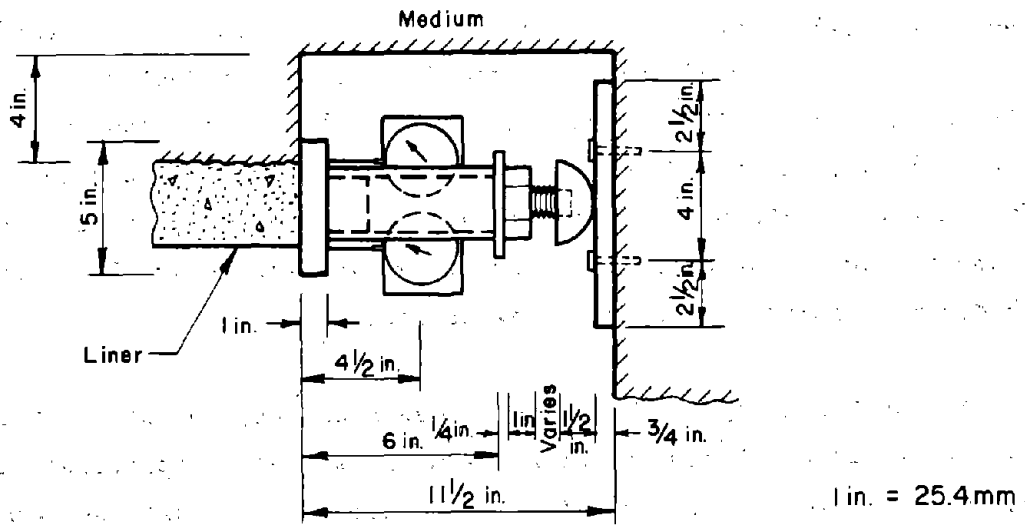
TOP VIEW OF THE BASE MECHANISM
